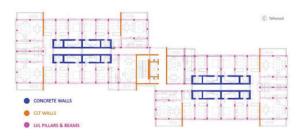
Plan with LVL pillars and beams, facade with diagonals and two reinforced concrete cores.
